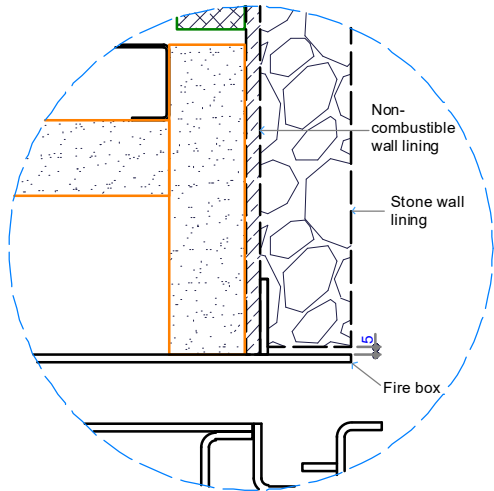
Sheet 4 of 8	Revision 1
